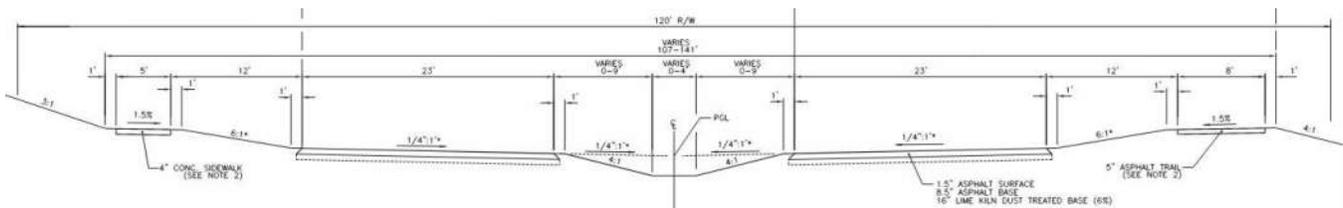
Typical South Liberty Parkway Cross Section (Oriented East)
